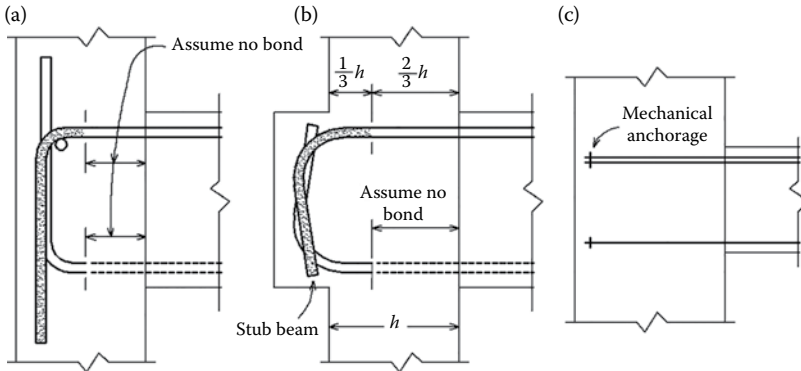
Suggested anchorage of bars in columns for exterior beam column connection using: (a) bent-up bars, (b) bent-up bars in stub beam, and (c) mechanical anchorage.
